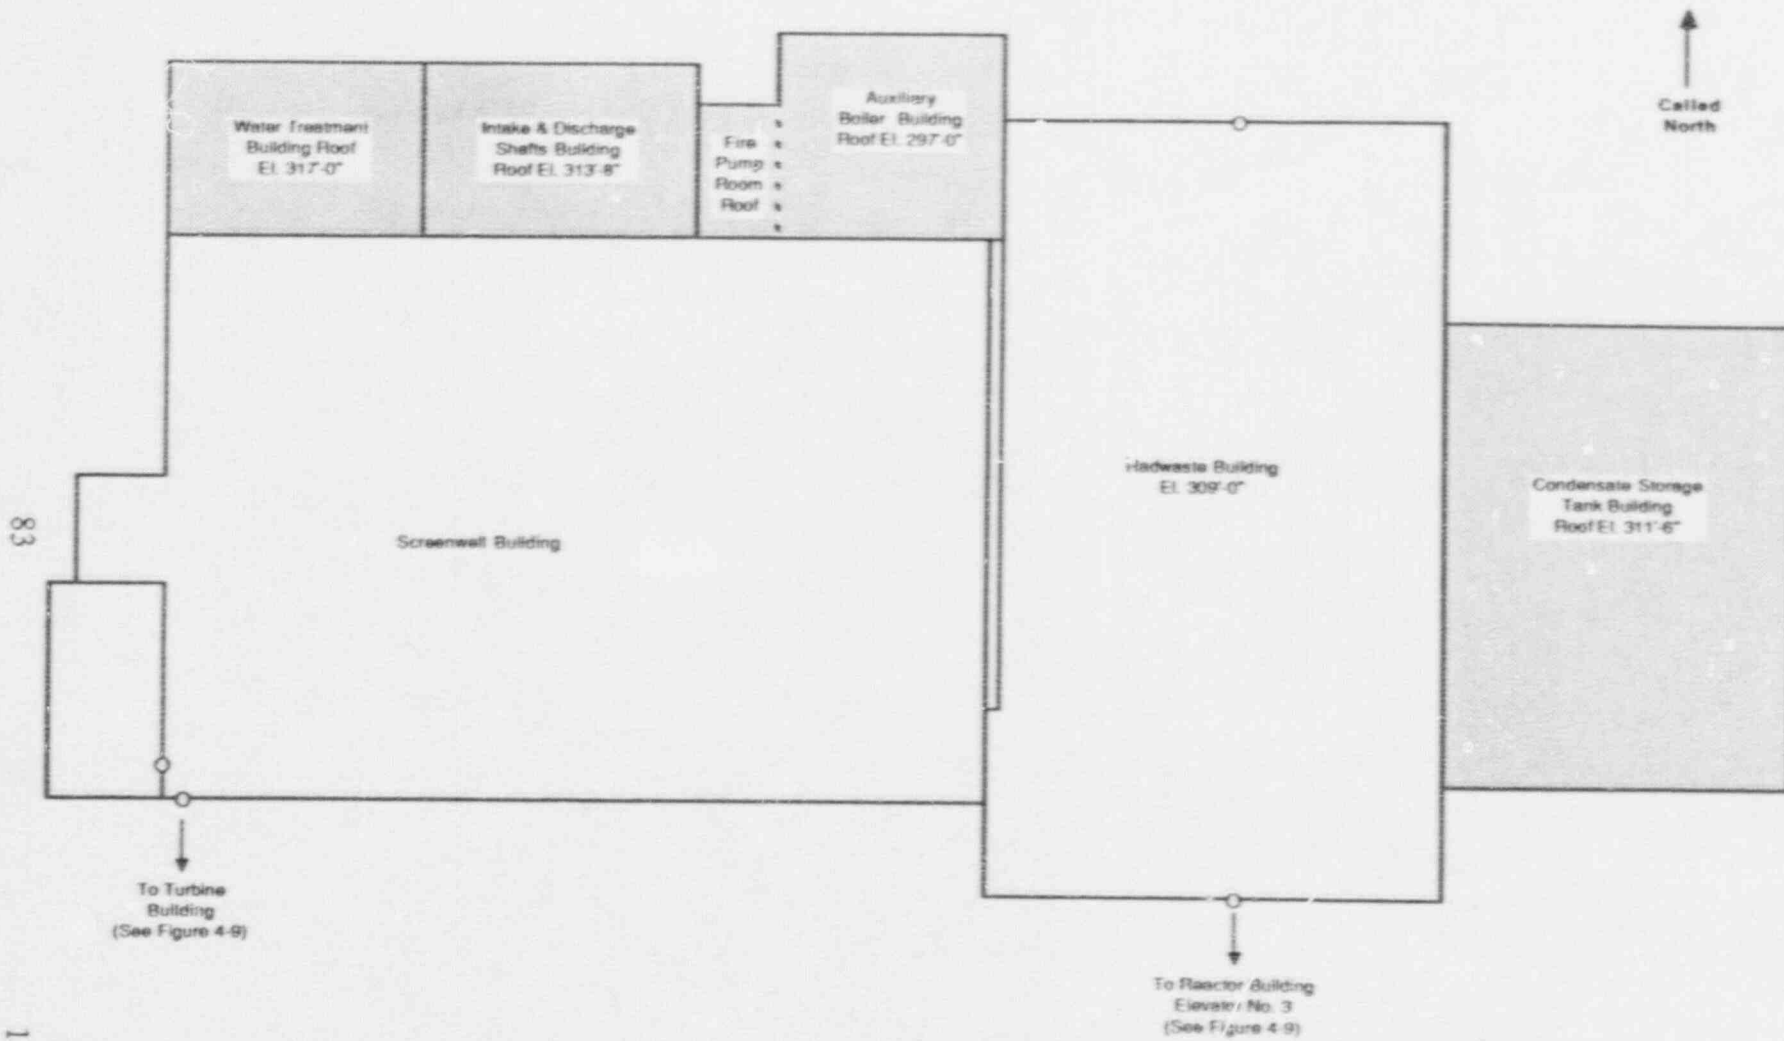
Nine Mile Point 2 Condensate Storage Tank and Adjacent Buildings, Elevation 306'-0"
